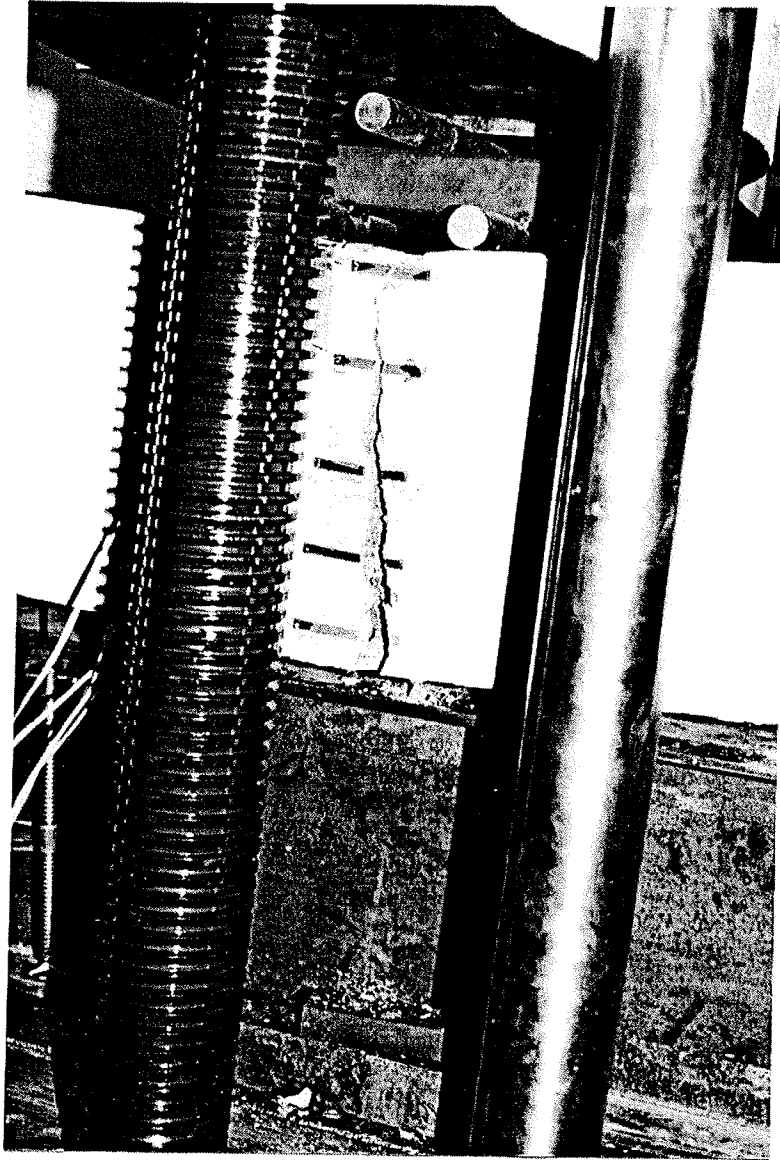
Deflection Measurement for Basalt Reinforced Concrete Beam
